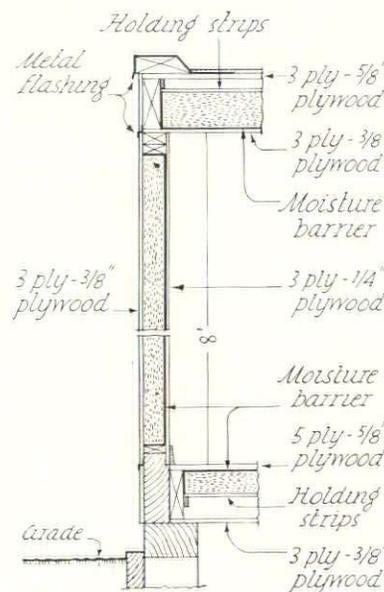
(left). Section showing typical assembly of floor, wall and roof panels. Figure 2 (above). Plan showing solid vertical member fitted into the grooves on the sides of adjacent wall panels
